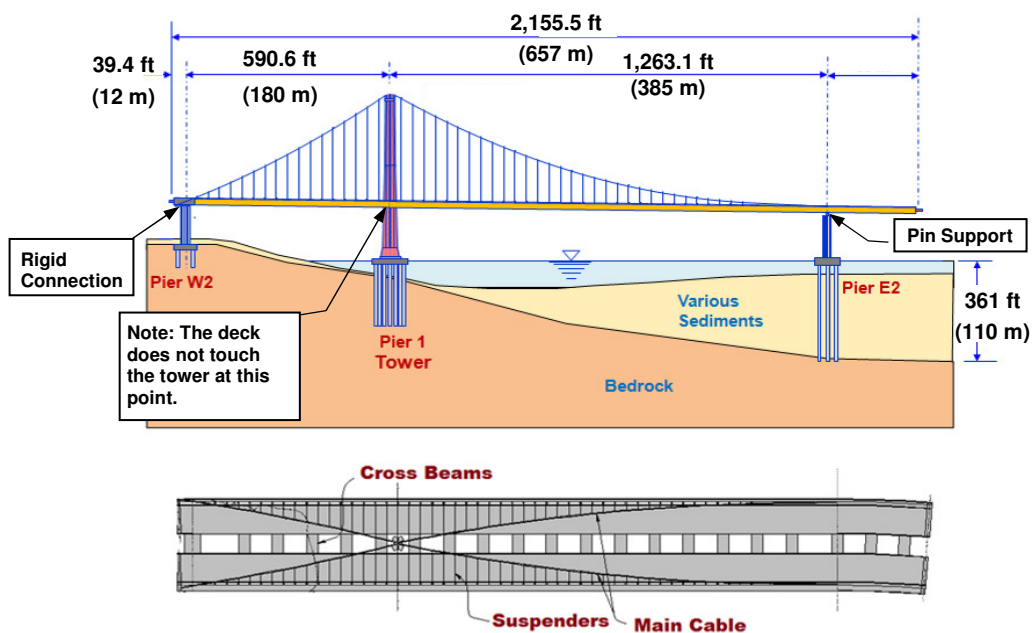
Elevation and Plan Views of the SAS Bay Bridge
